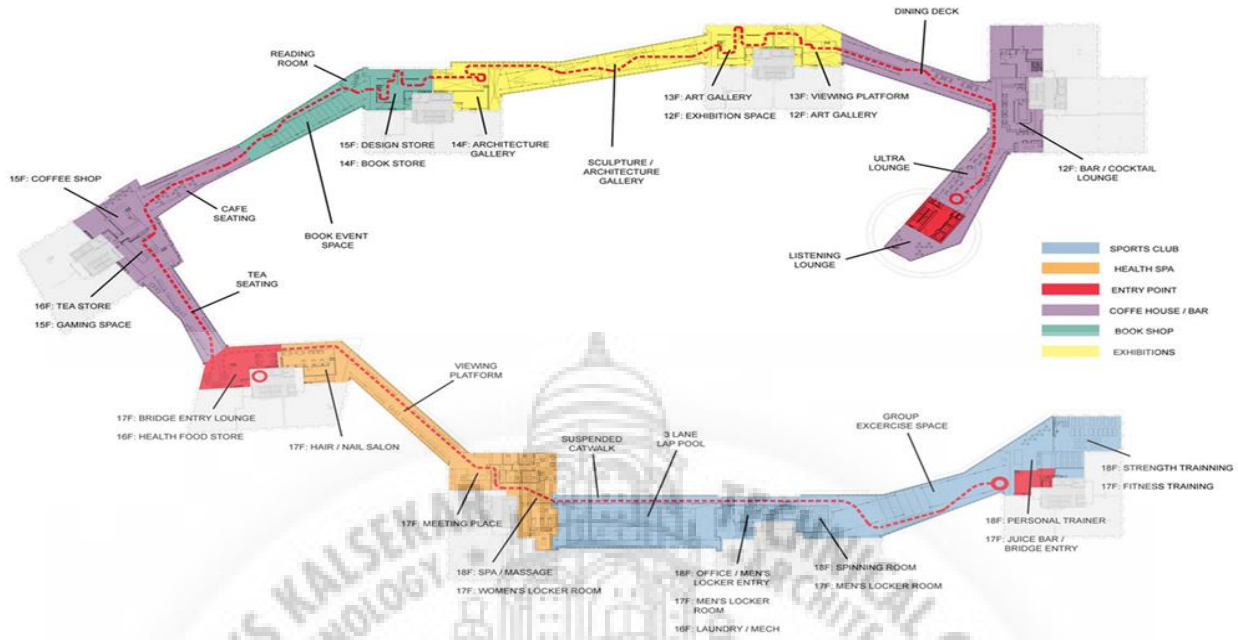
Link Hybrid building layout (Source – Arcdaily)
